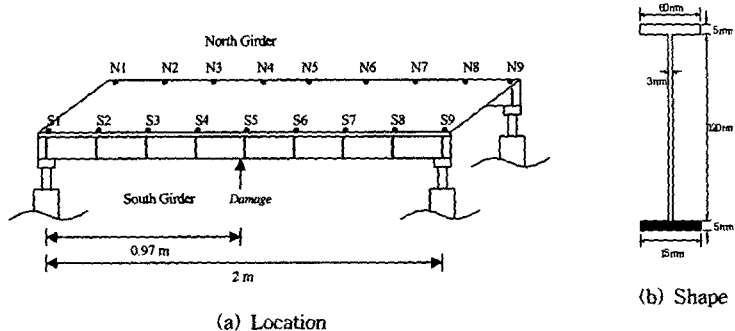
Cross-Section of Steel Plate-Girder Bridge
